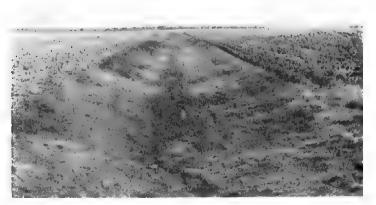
An open ditch with 3:1 side slopes that have been planted to grasses and legumes to stabilize the banks.
